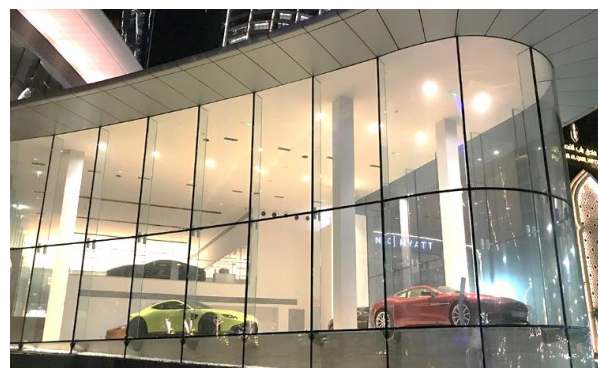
Example of laminated glass beams used as supporting structural elements for a transparent façade. Source: V.A. Silvestru/ETH Zurich
